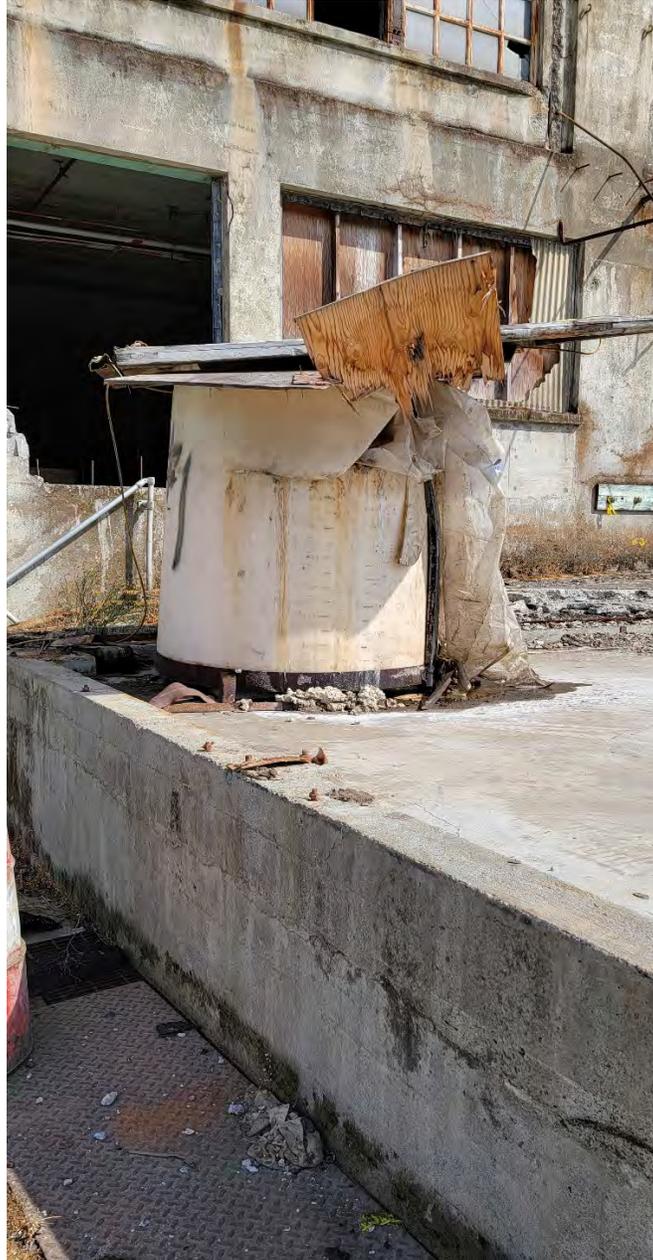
South of Building 18 – White poly tank filled with construction debris. Former contents unknown. (ID 18-A-220921-1)
